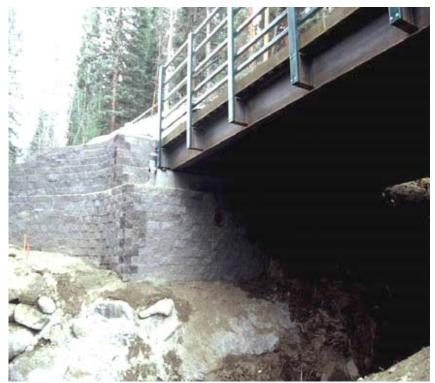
Geosynthetically Confined Soil Bridge Abutment [18]
